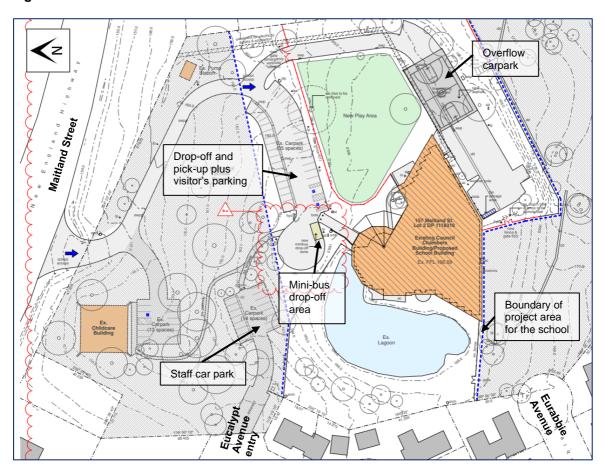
| Location of carparks and entries to the site (Source: Applicant's RTS)
